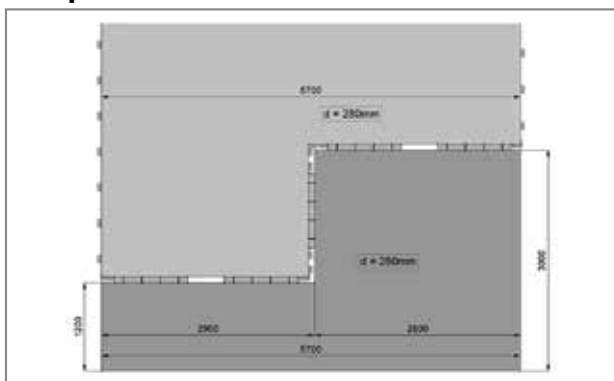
Schöck Isokorb® T type K-E, K-T: Geometry of the interior floor slab and balcony
